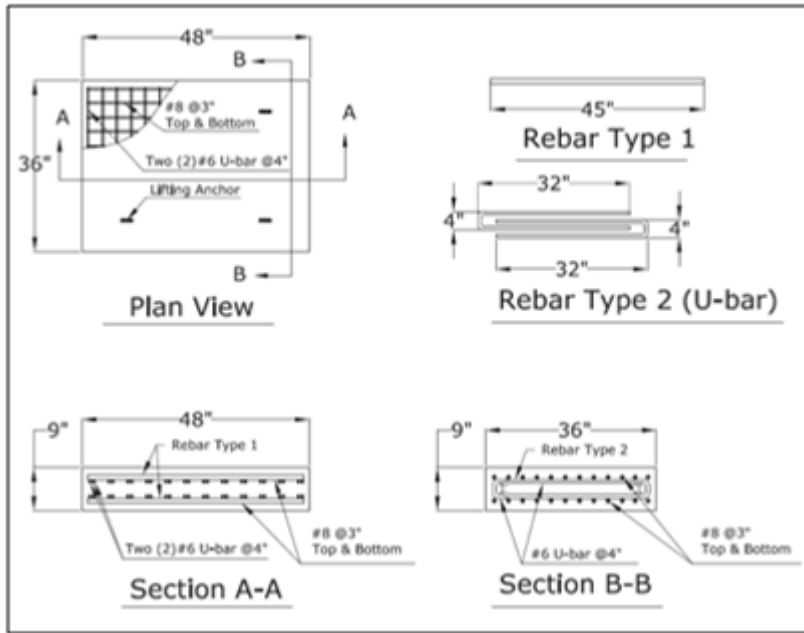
Slab Layout for 36 in. (91 cm) Pipe
